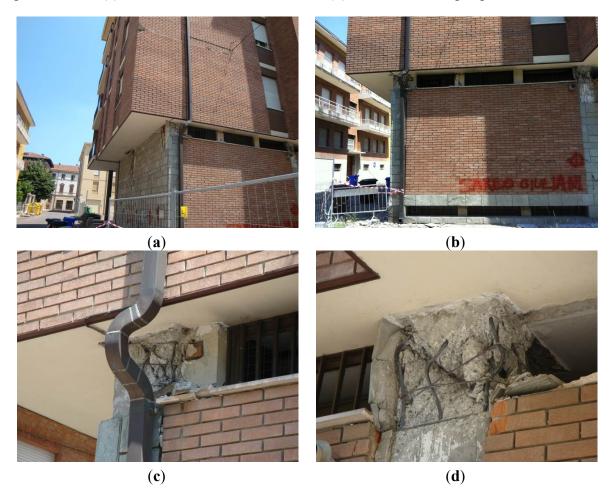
(a) Damage to infill masonry walls; (b) Diagonal crack propagation from infill wall to RC column.
